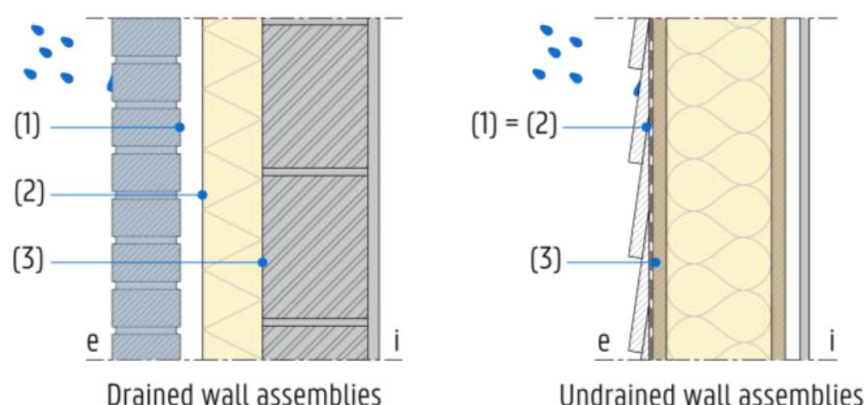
Rainwater infiltration locations in drained and undrained wall assemblies: (1) interior side of cladding, (2) exterior side of drainage barrier, (3) interior side of drainage barrier.
